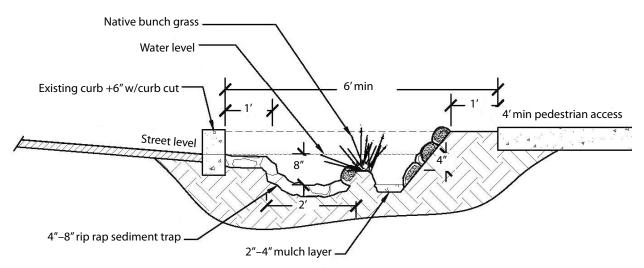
Section A1. Typical cross sectin of sediment trap for curb cut with rock-lined basin.
